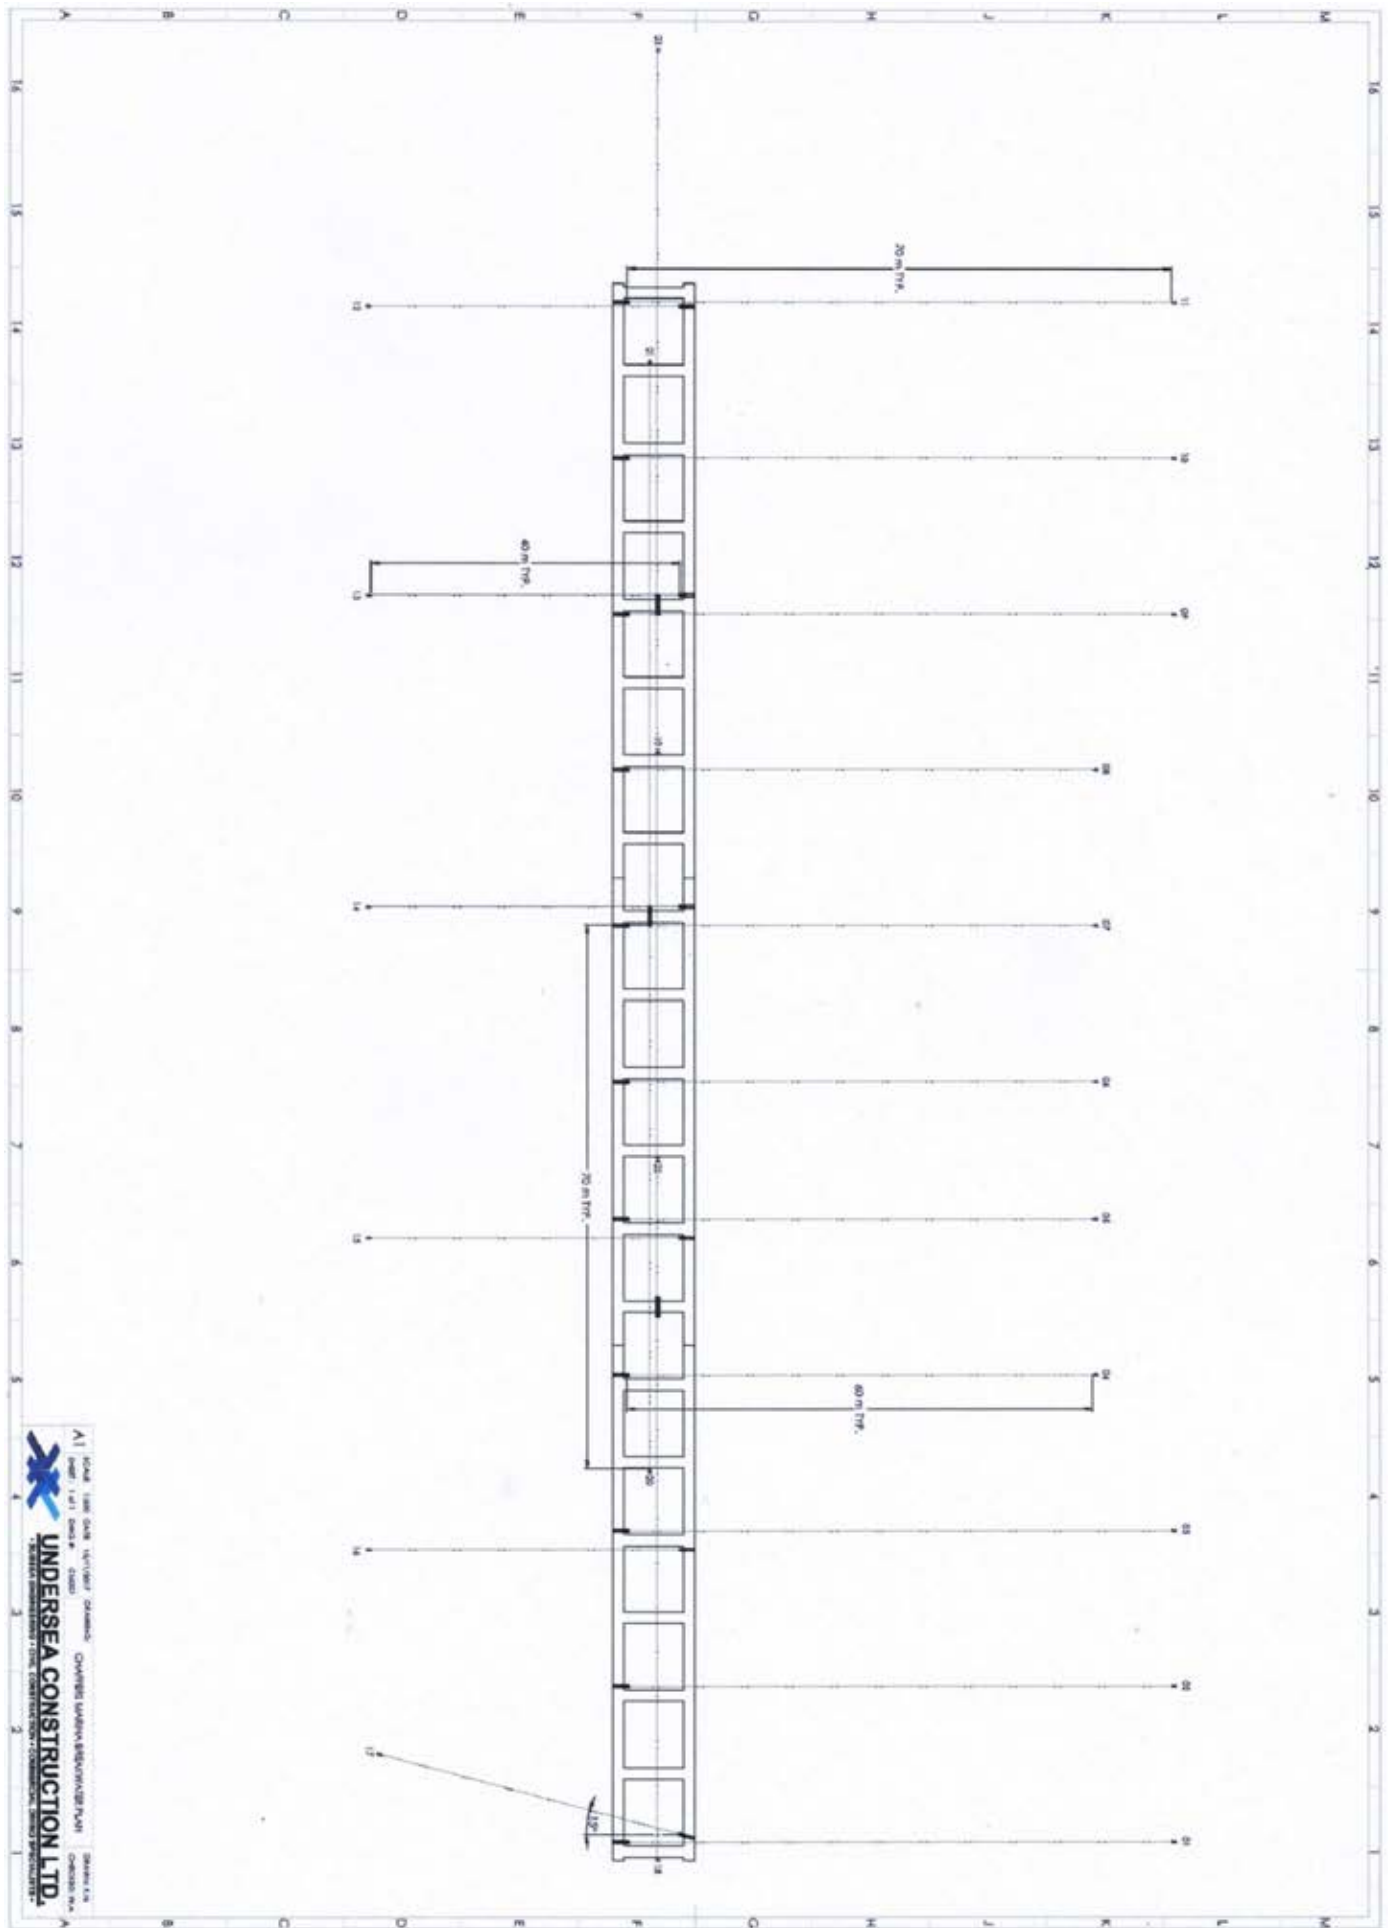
Breakwater and mooring layout diagram (refer to separate drawing for detail in A1 scale)
